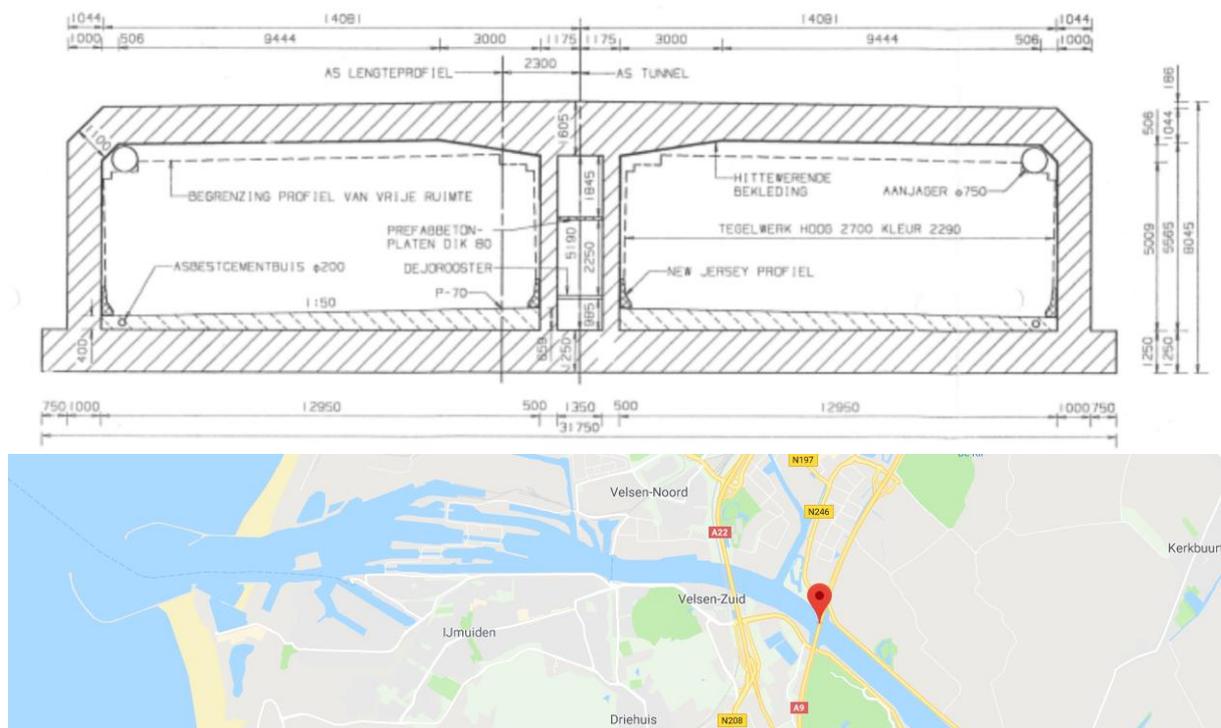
, WIJERTUNNEL CROSS SECTION AND LOCATION
